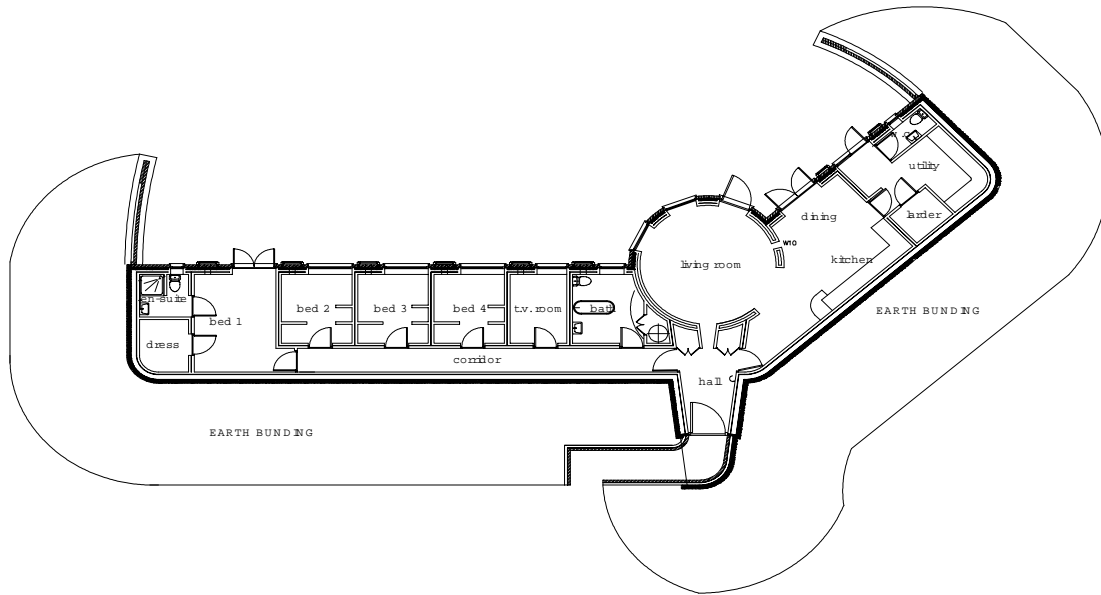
Floor plan of Harrall's © single-storey Lincolnshire esh unit
